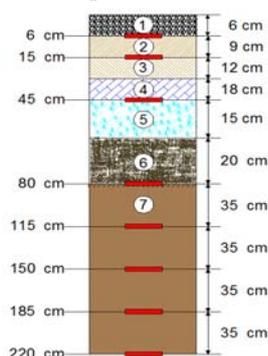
Scheme for location of sensors in pavement structure and subgrade for section with asphalt concrete pavement of "Astana-Burabai" highway: 1...6 – numbers of pavement layers; 7 – subgrade; ■ - temperature and moisture sensors
